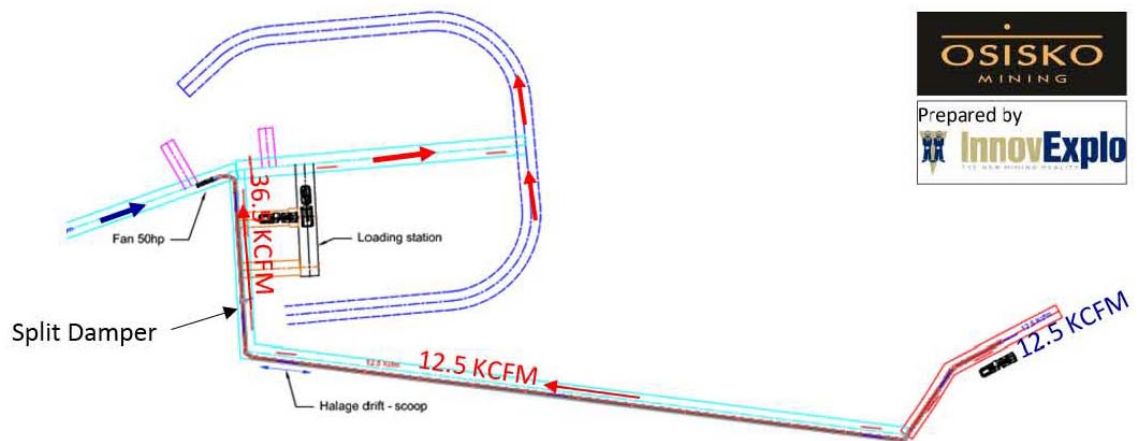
Typical layout for auxiliary ventilation in the Lynx Zone.
